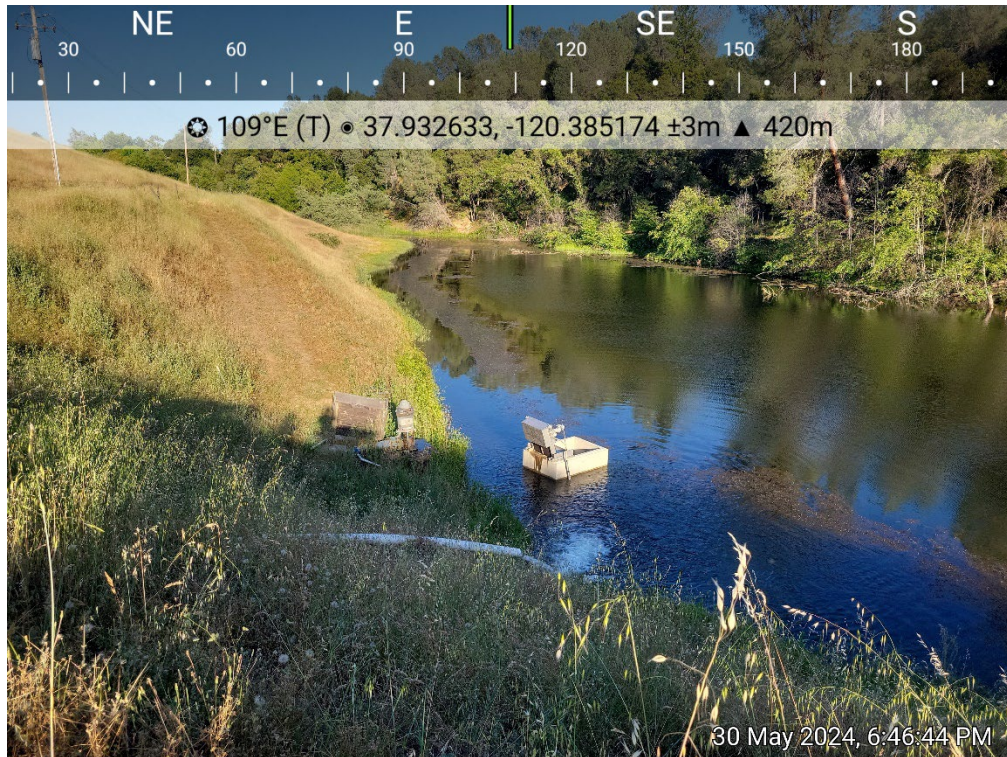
View looking east toward Storage Pond 1. The portion in the Study Area is in the foreground with the existing pump equipment.
